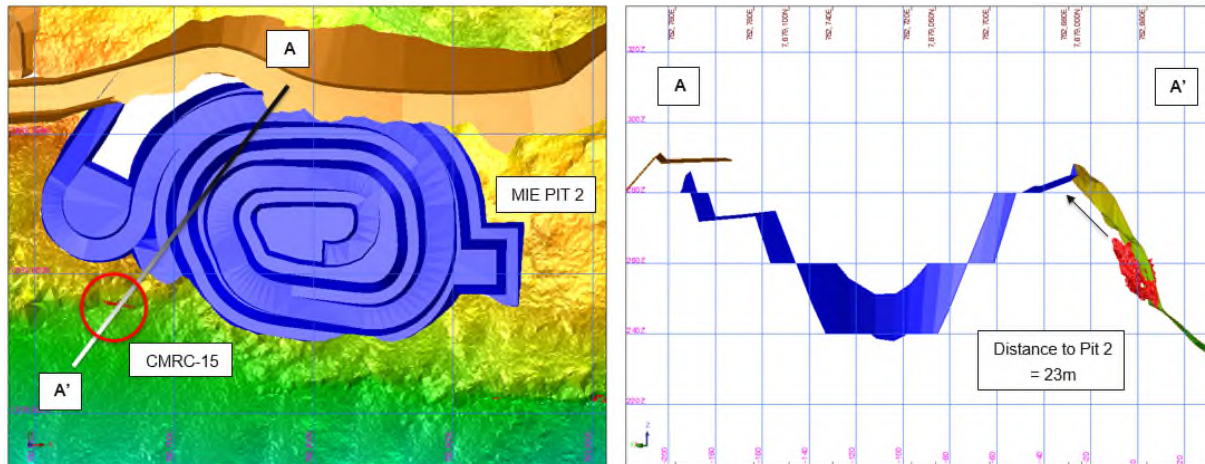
Cross-section of Cave CMRC-13 (Category 4) and Miralga East Pit 2
